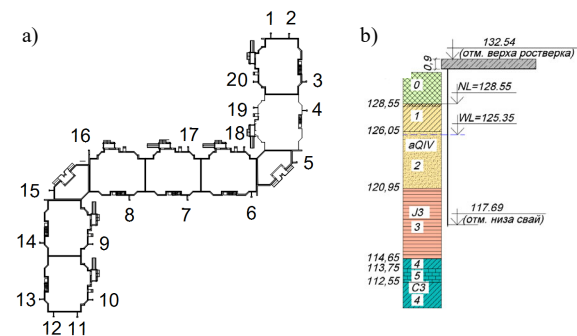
The residential building No. 10's scheme with geodetic marks (a) and subsoil profile (b).
